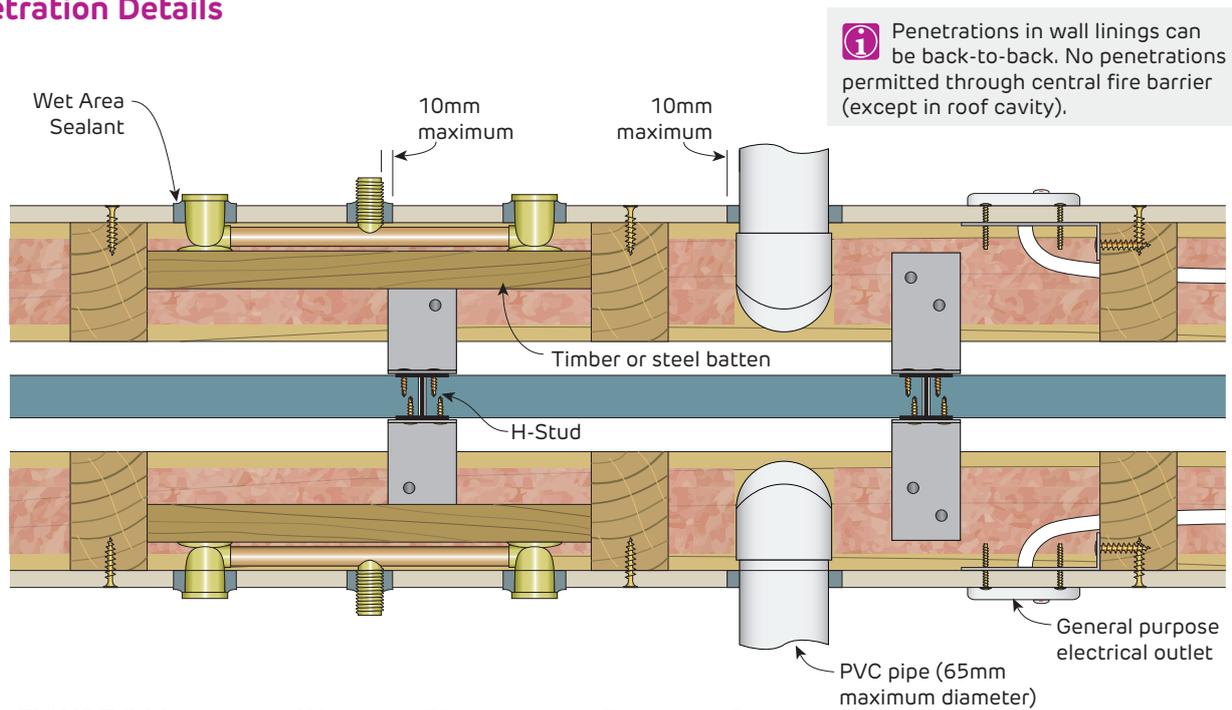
Interhome Wall with Plumbing and Electrical Penetrations in Wall Linings
